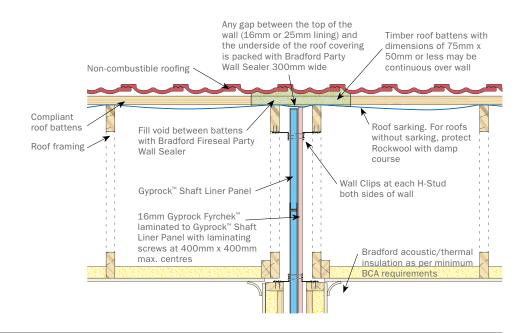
Party Wall/Roof Junction (Metal Roof/Gyprock Party Wall)
